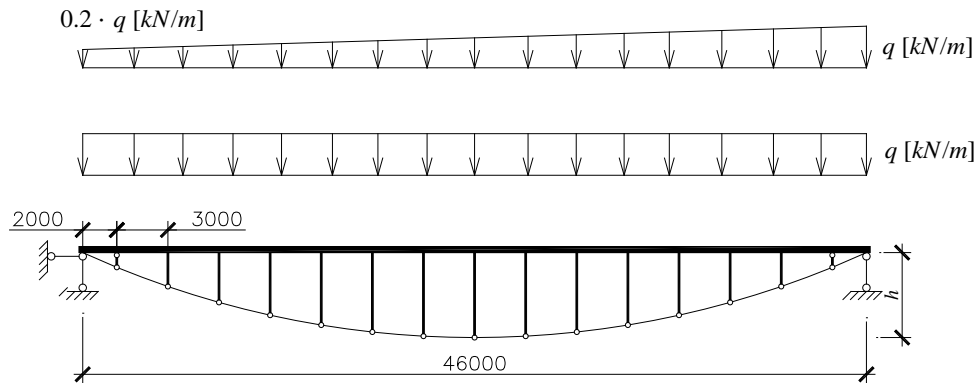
Design scheme of trussed beam.  $q$  – load bearing capacity,  $h$  – height of trussed beam. (Spatial bracings conditionally are not shown in Fig.3)
